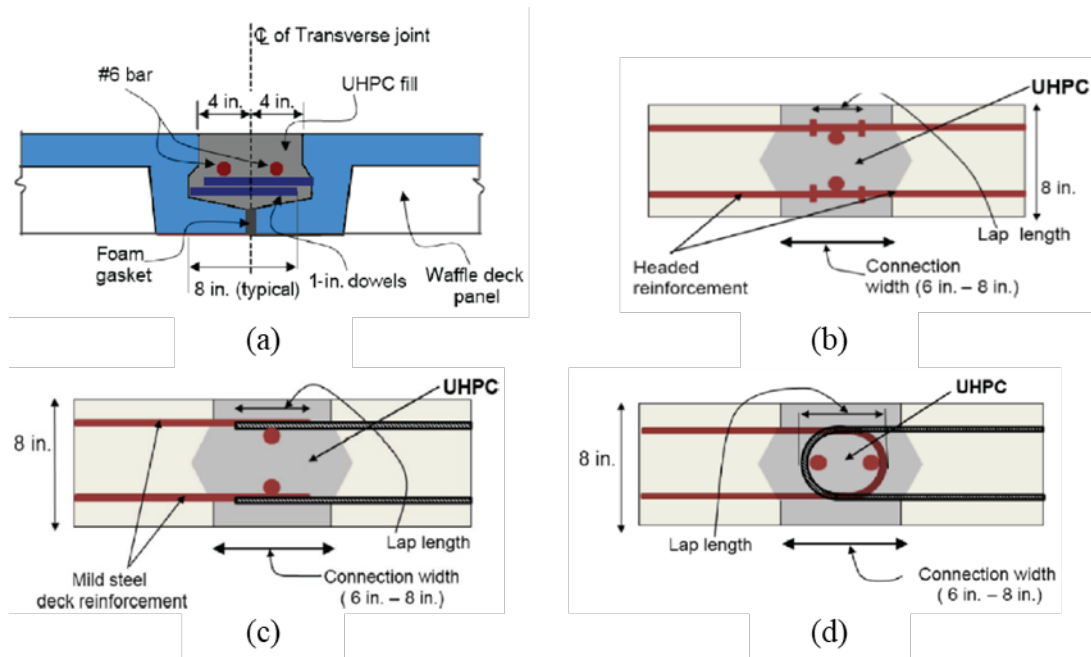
Common panel-to-panel UHPC connection details: (a) waffle deck panel-to-panel connection detail, (b) panel-to-panel headed connection detail, (c) panel-to-panel straight connection detail, and (d) panel-to-panel hairpin reinforcement [28]
